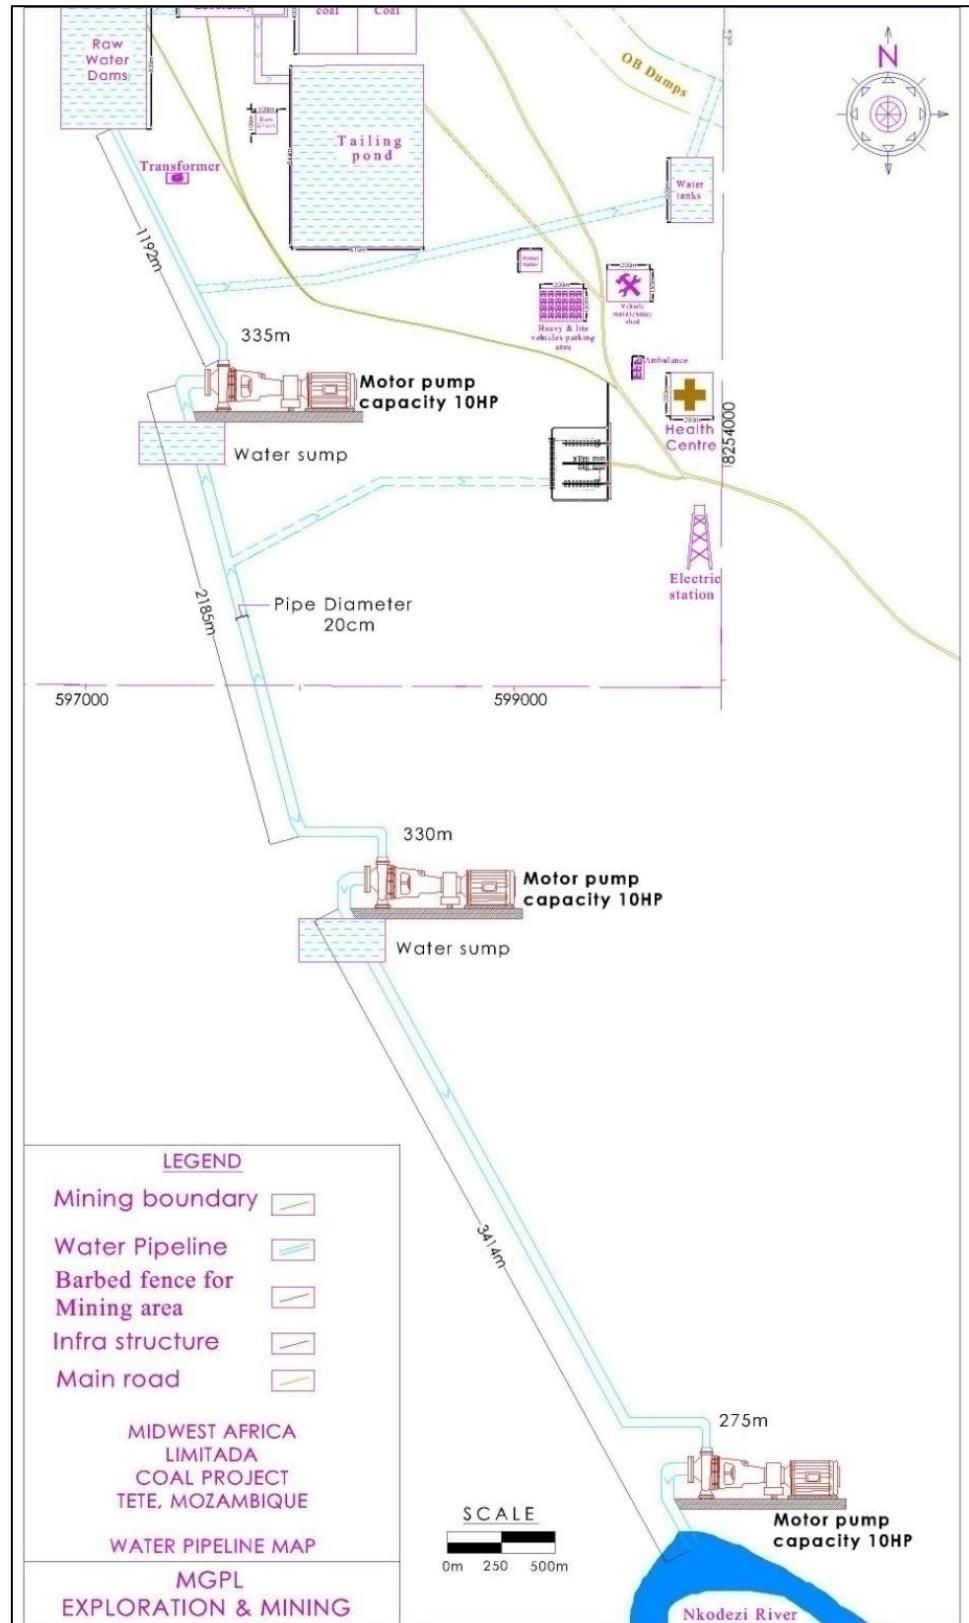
Water Pipe Line Alignment From Nkondezi River to 5086C.
